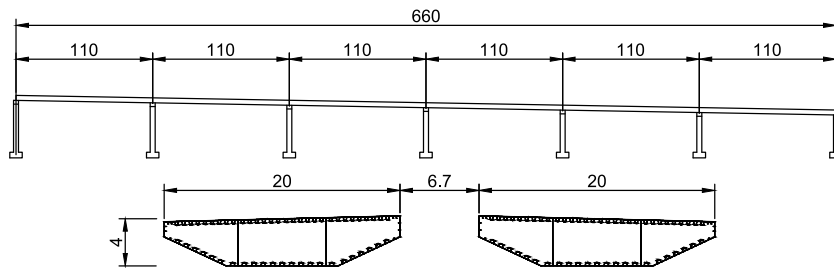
Layout and cross-section of the non-navigational continuous bridge (unit: m).
